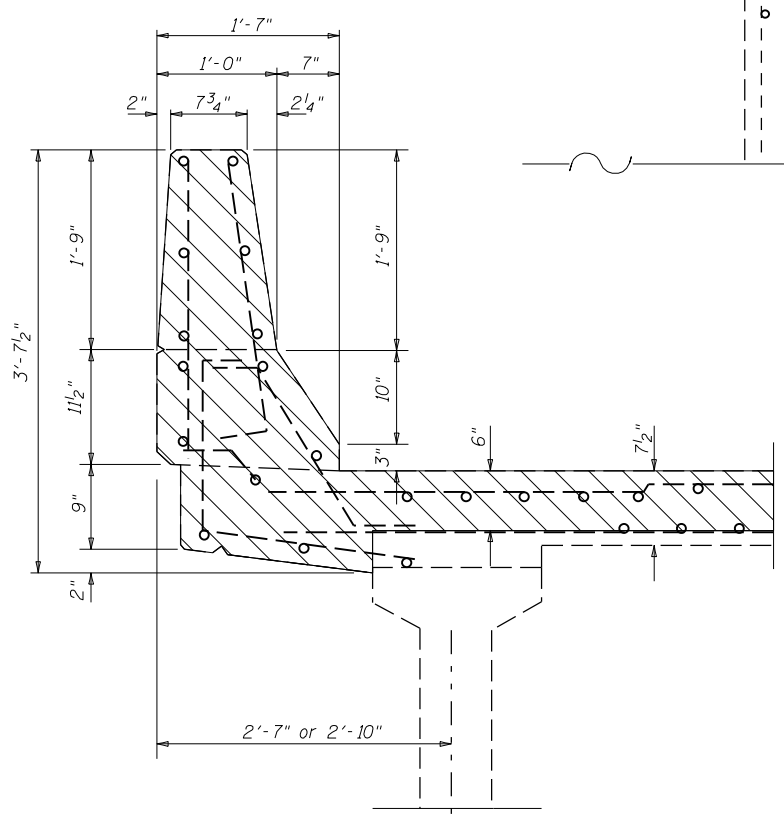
DETAIL OF CONCRETE SUPERSTRUCTURE PIER 1
